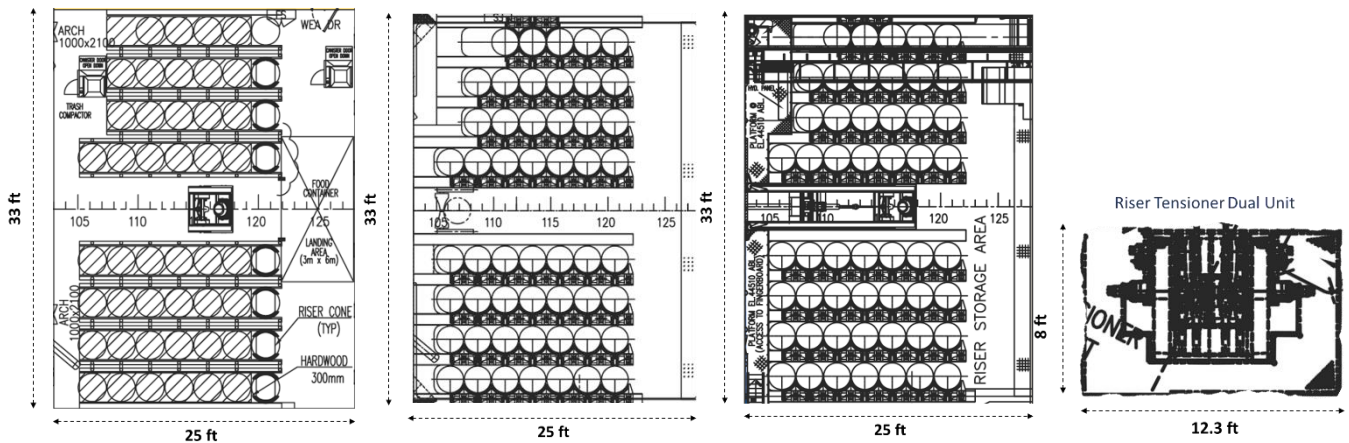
Riser string storage space in (a) Lower Deck (b) Main Deck (c) Upper Deck / (d) Riser Tensioner Dual Unit
